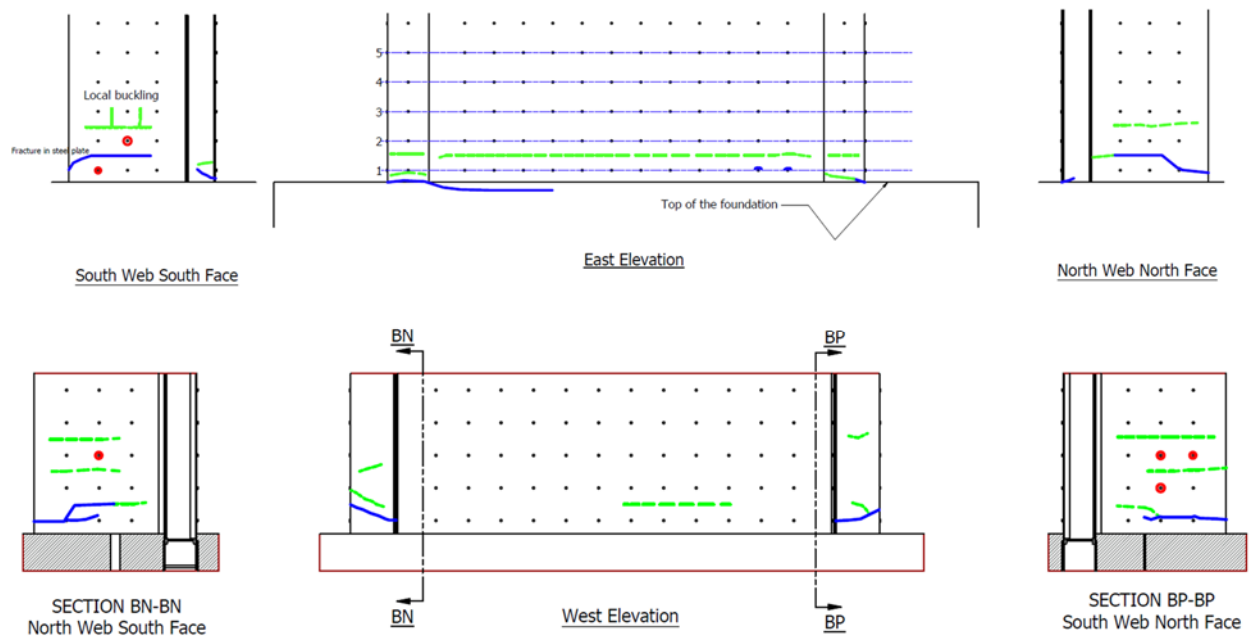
Post-test damage inspection of the wall steel plates for Specimen C1
